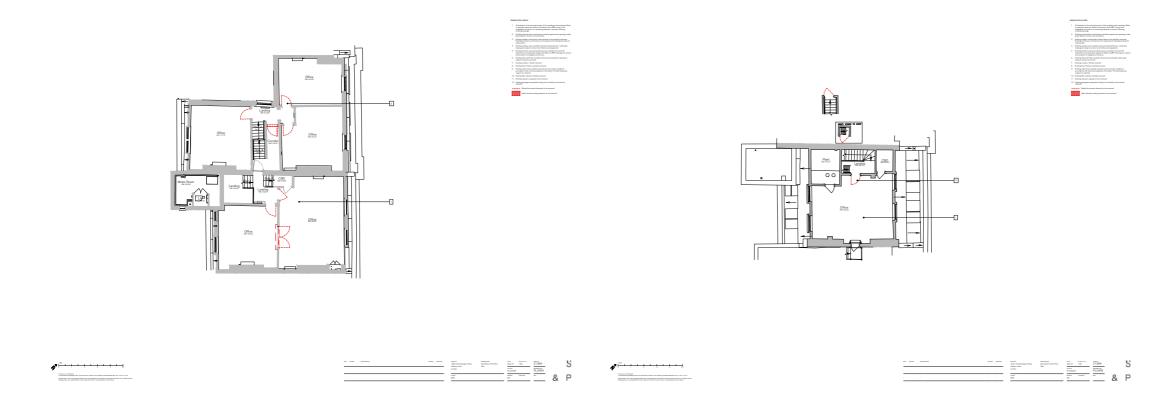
(Left) - Third Floor Plan, Demolition as Proposed (S & P Architects, 2021). Figure 87 (Right) - Fourth Floor Plan, Demolition as Proposed (S & P Architects, 2021).
